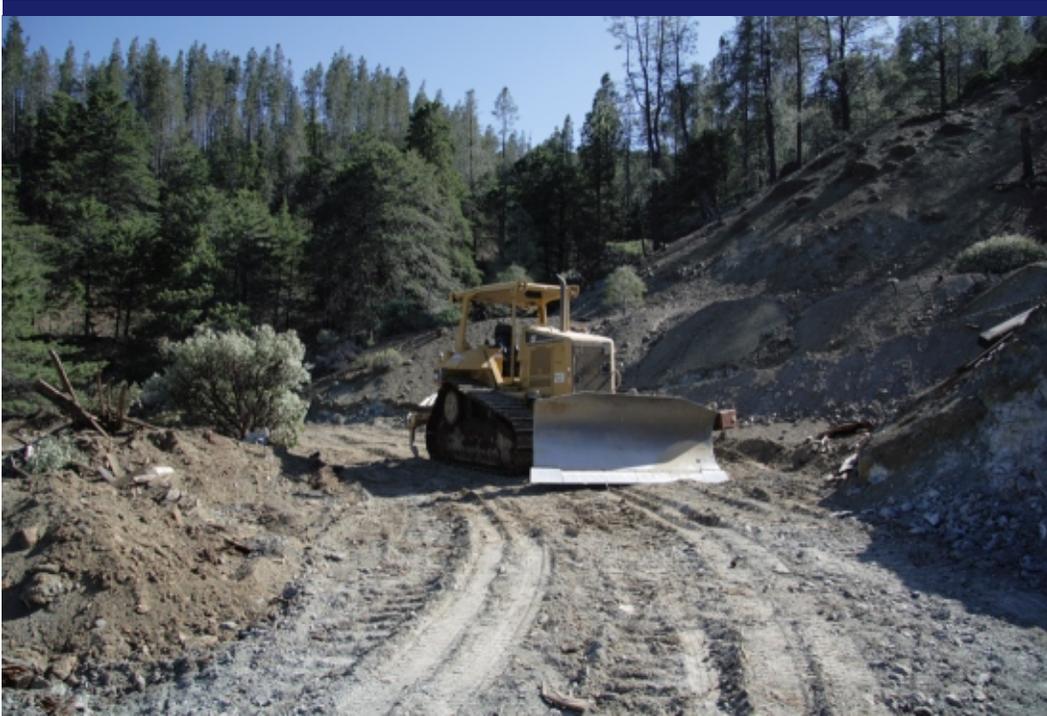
A bulldozer was used to restore the old mining roads at the site.
